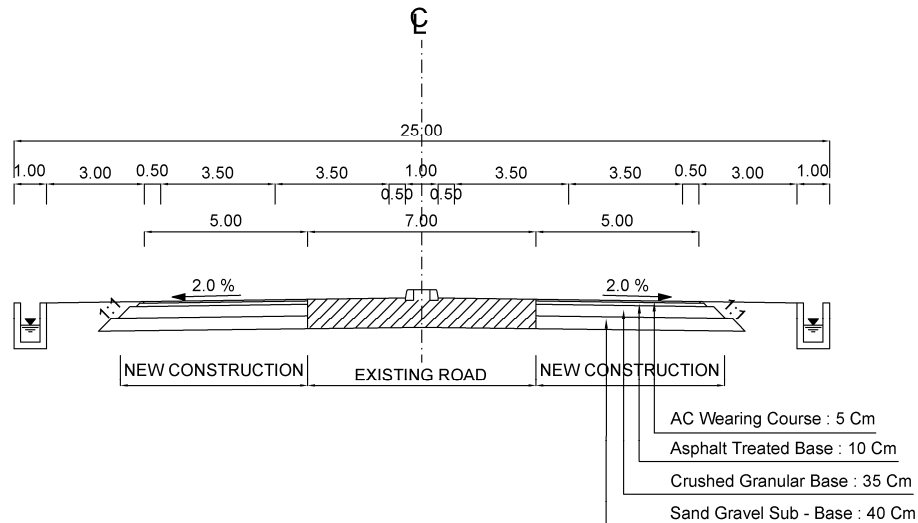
Typical Cross Section of Access Road to Bojonegara New Port
